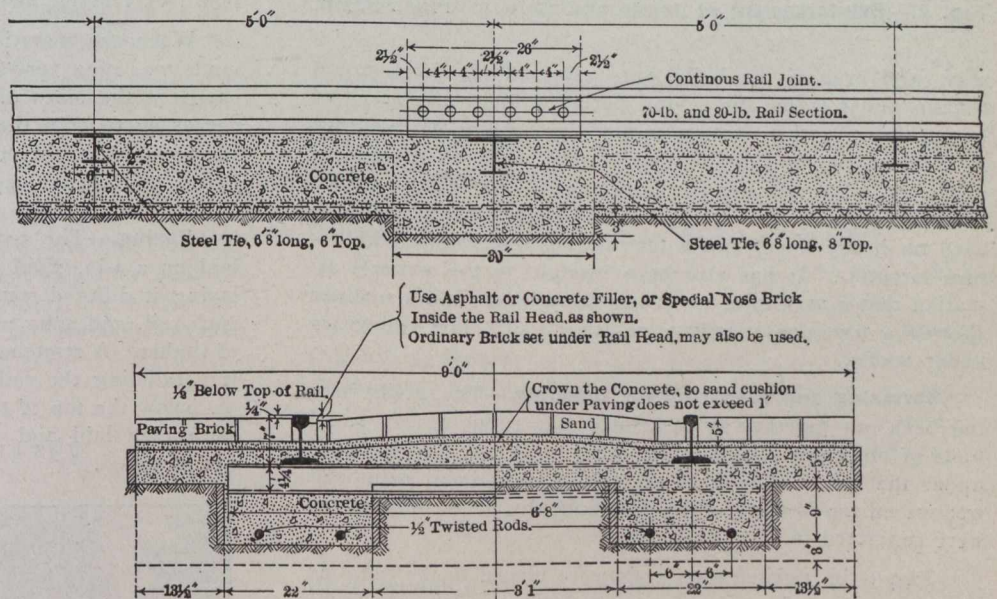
Section of Concrete Steel Tie Track Construction.
